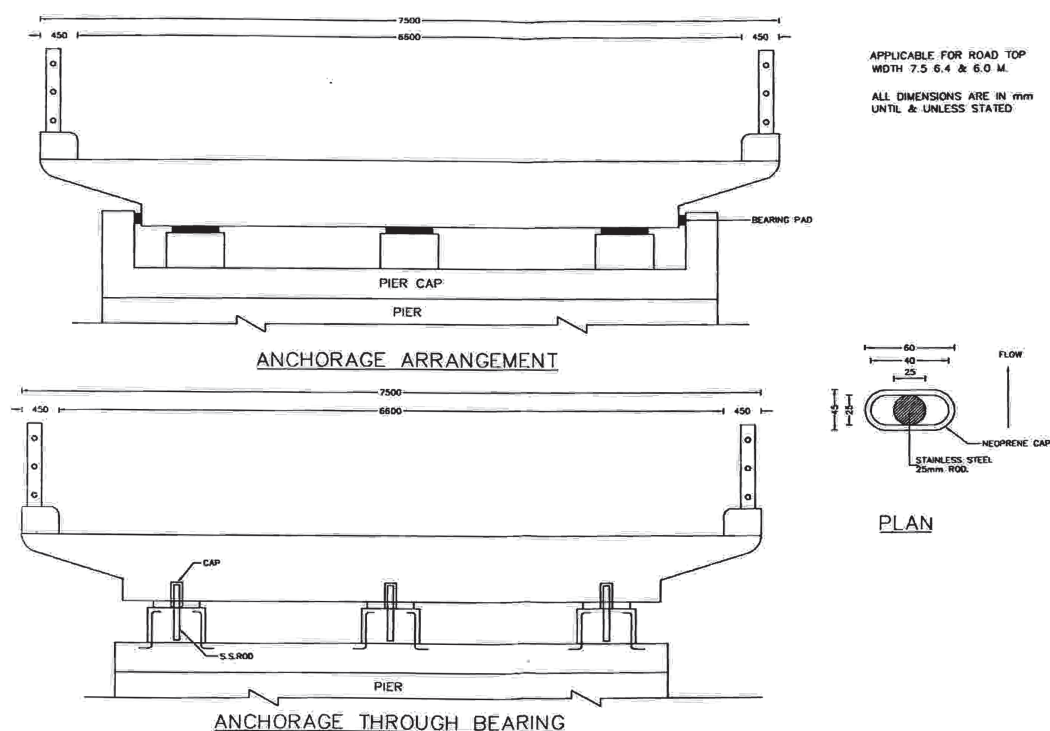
Anchorage Arrangement for Submersible Bridge
